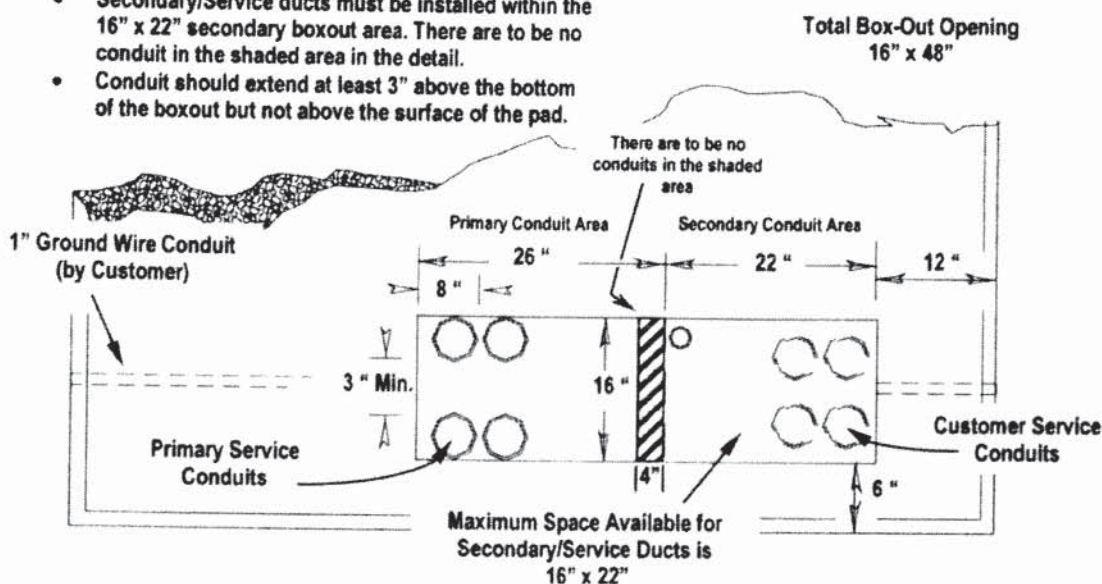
Construction Details for Customer Installed Electric Facilities
